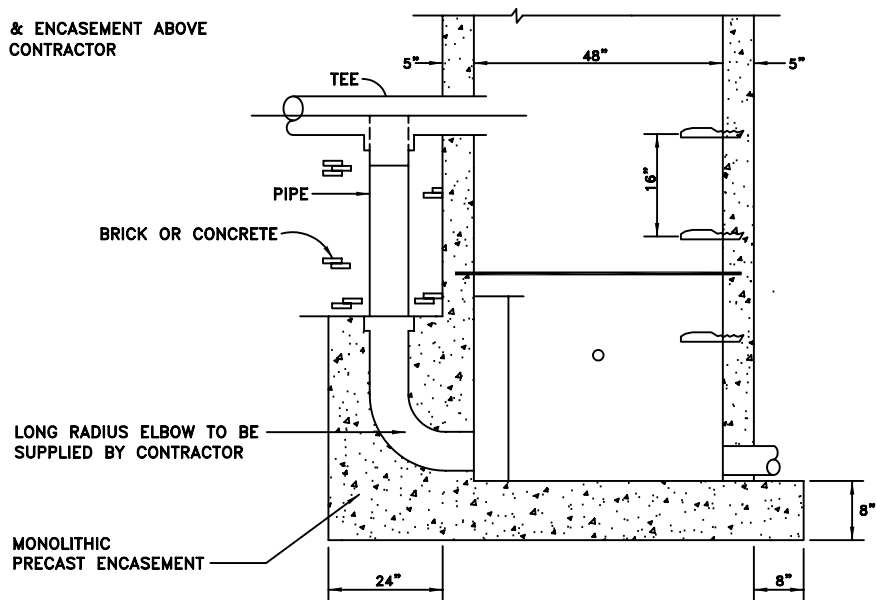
DETAIL: SHALLOW PRECAST SEWER MANHOLE NO SCALE
